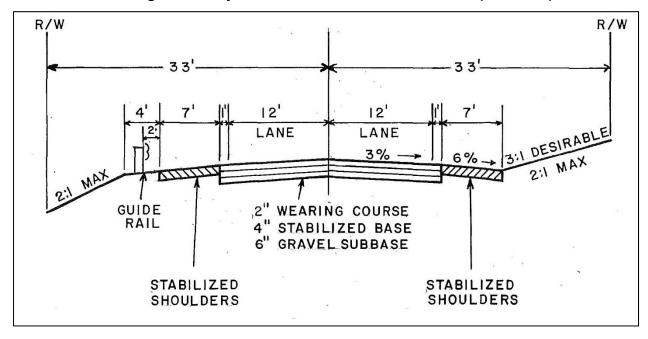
Minor Arterial Cross-Section (1982 Plan)
